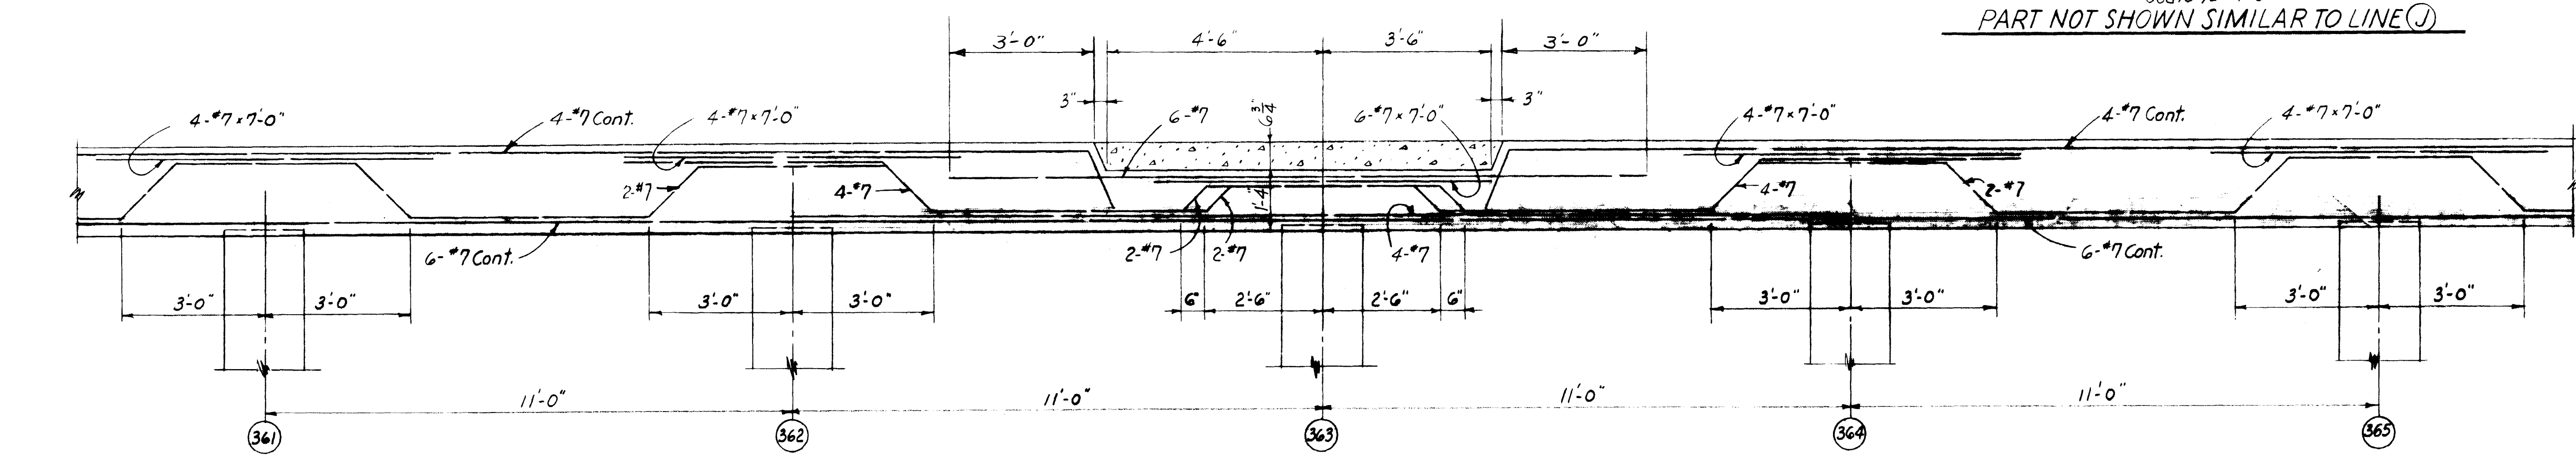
DETAIL OF RAILROAD BEAMS ALONG LINES (L) & (M) NORTH DECK
